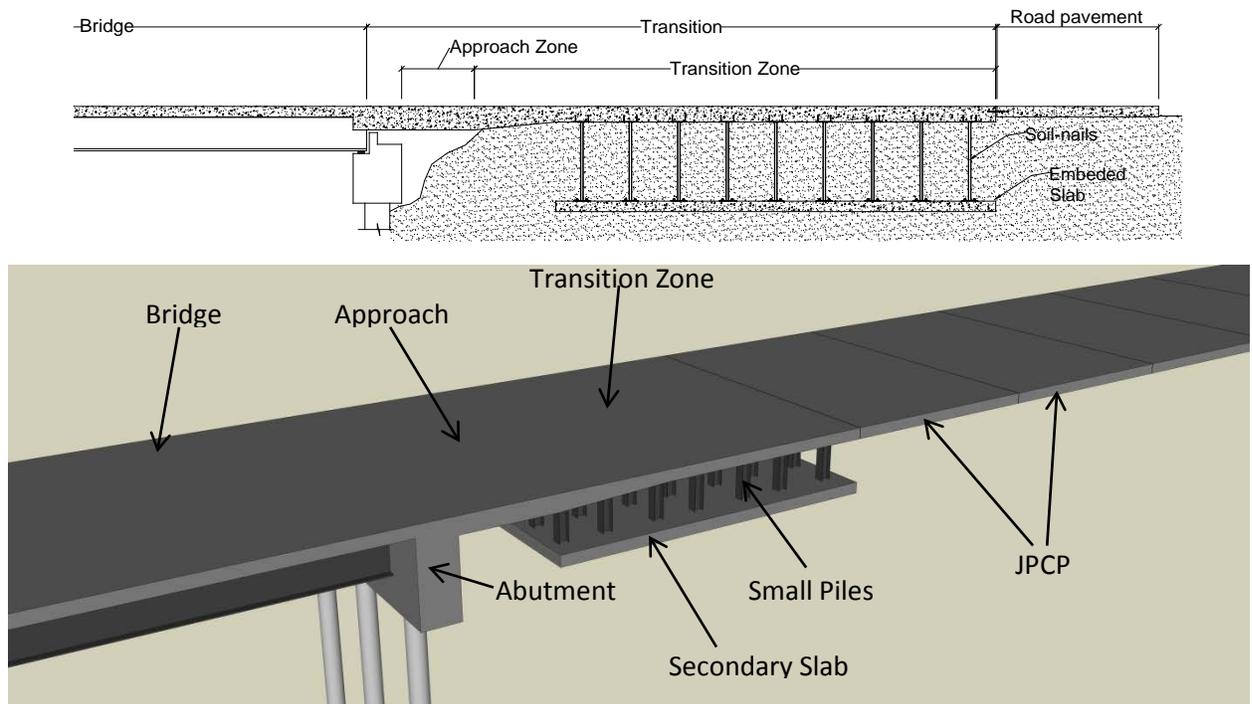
Schematic and rendering of the recommended practice for bridge/roadway interface.
